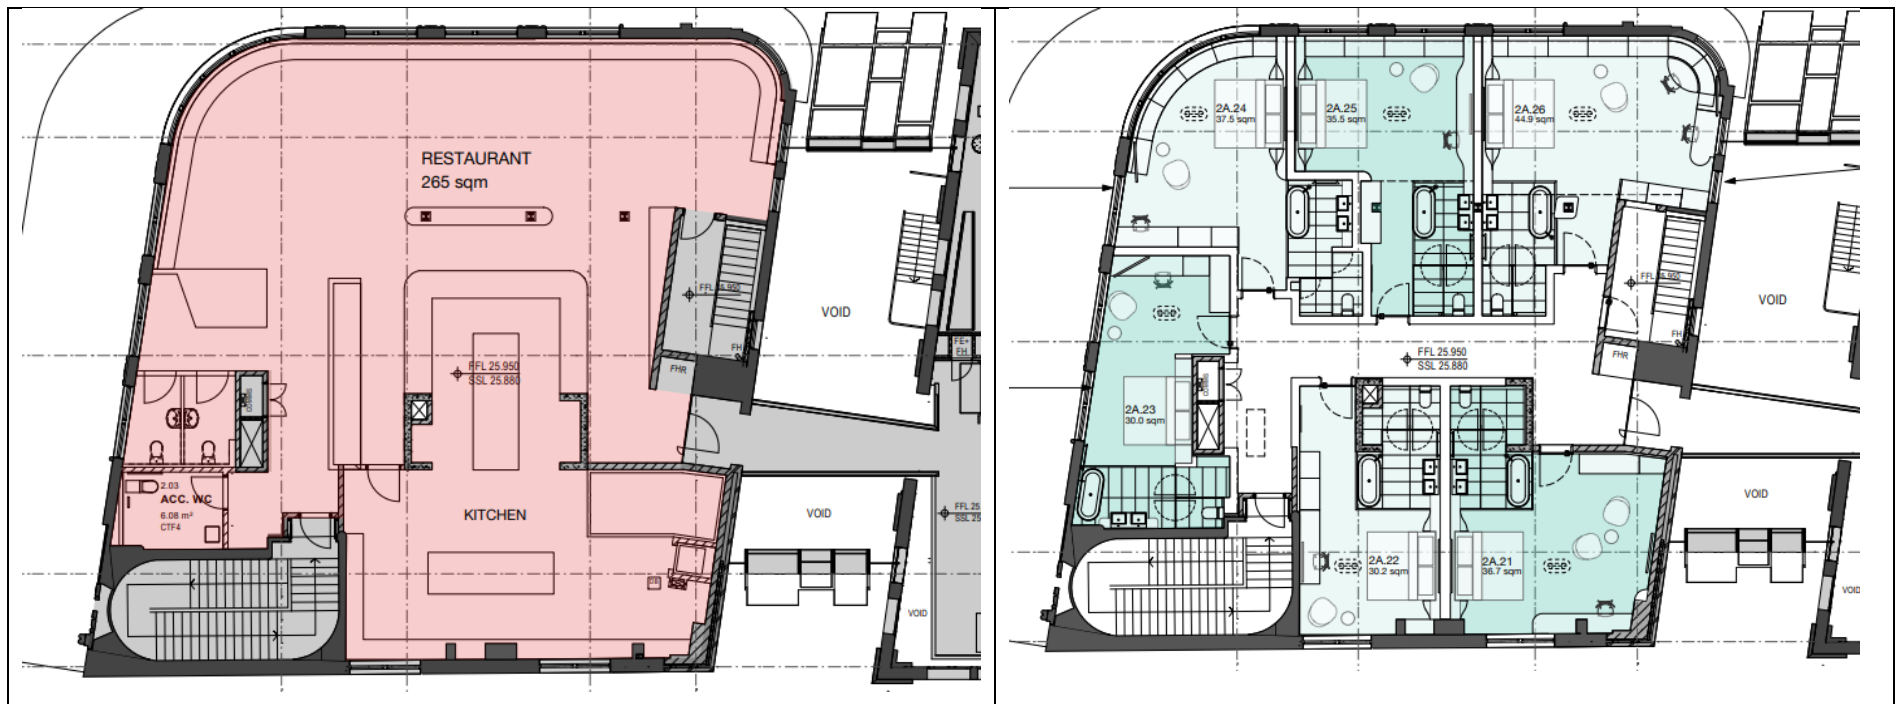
| Approved restaurant on level 2 (left) and proposed conversion into 6 hotel rooms (right)
